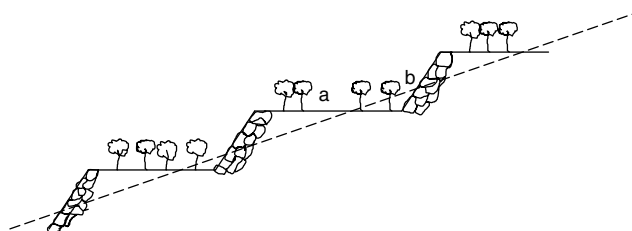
Cross section of bench terraces: a—level bench; b—riser.
